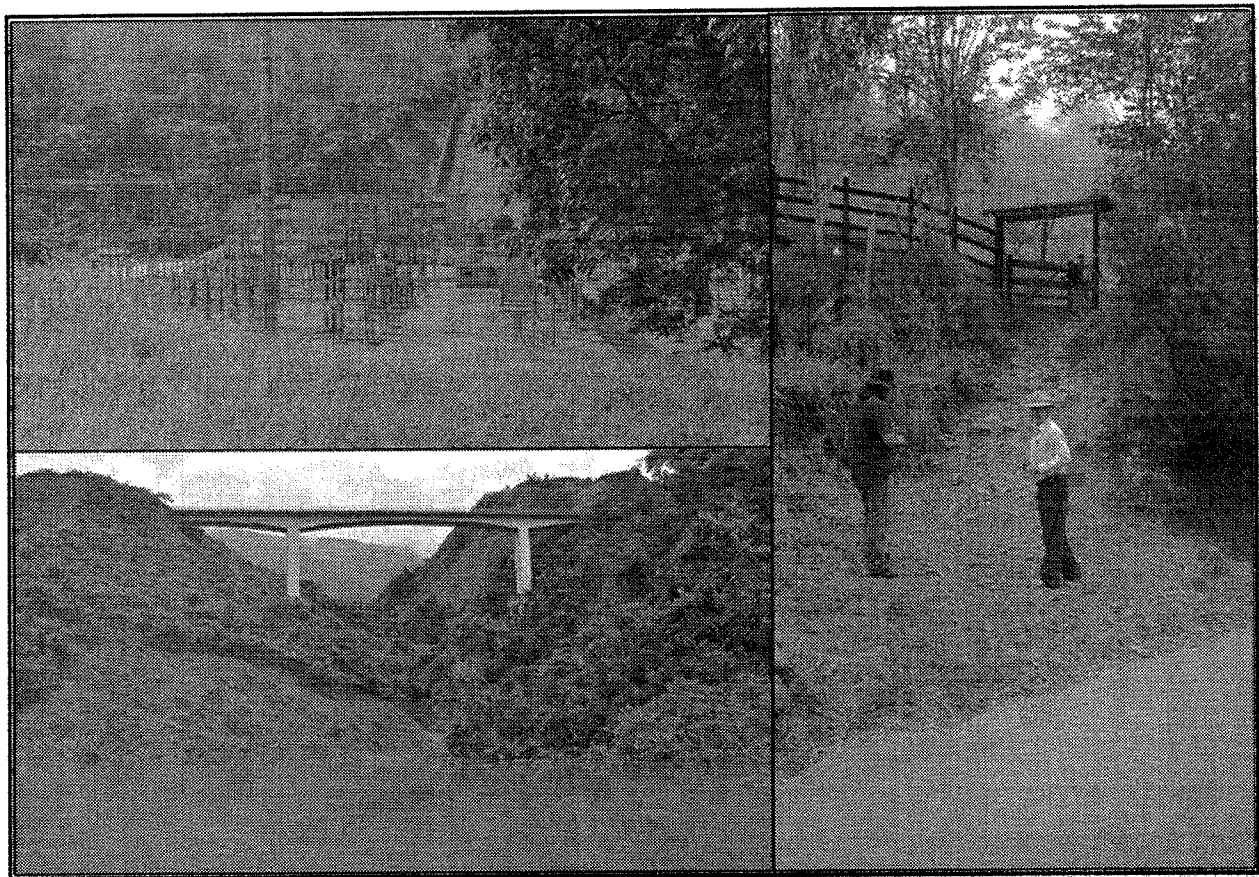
SANTA ELENA PROJECT SURROUNDING INFRASTRUCTURE
